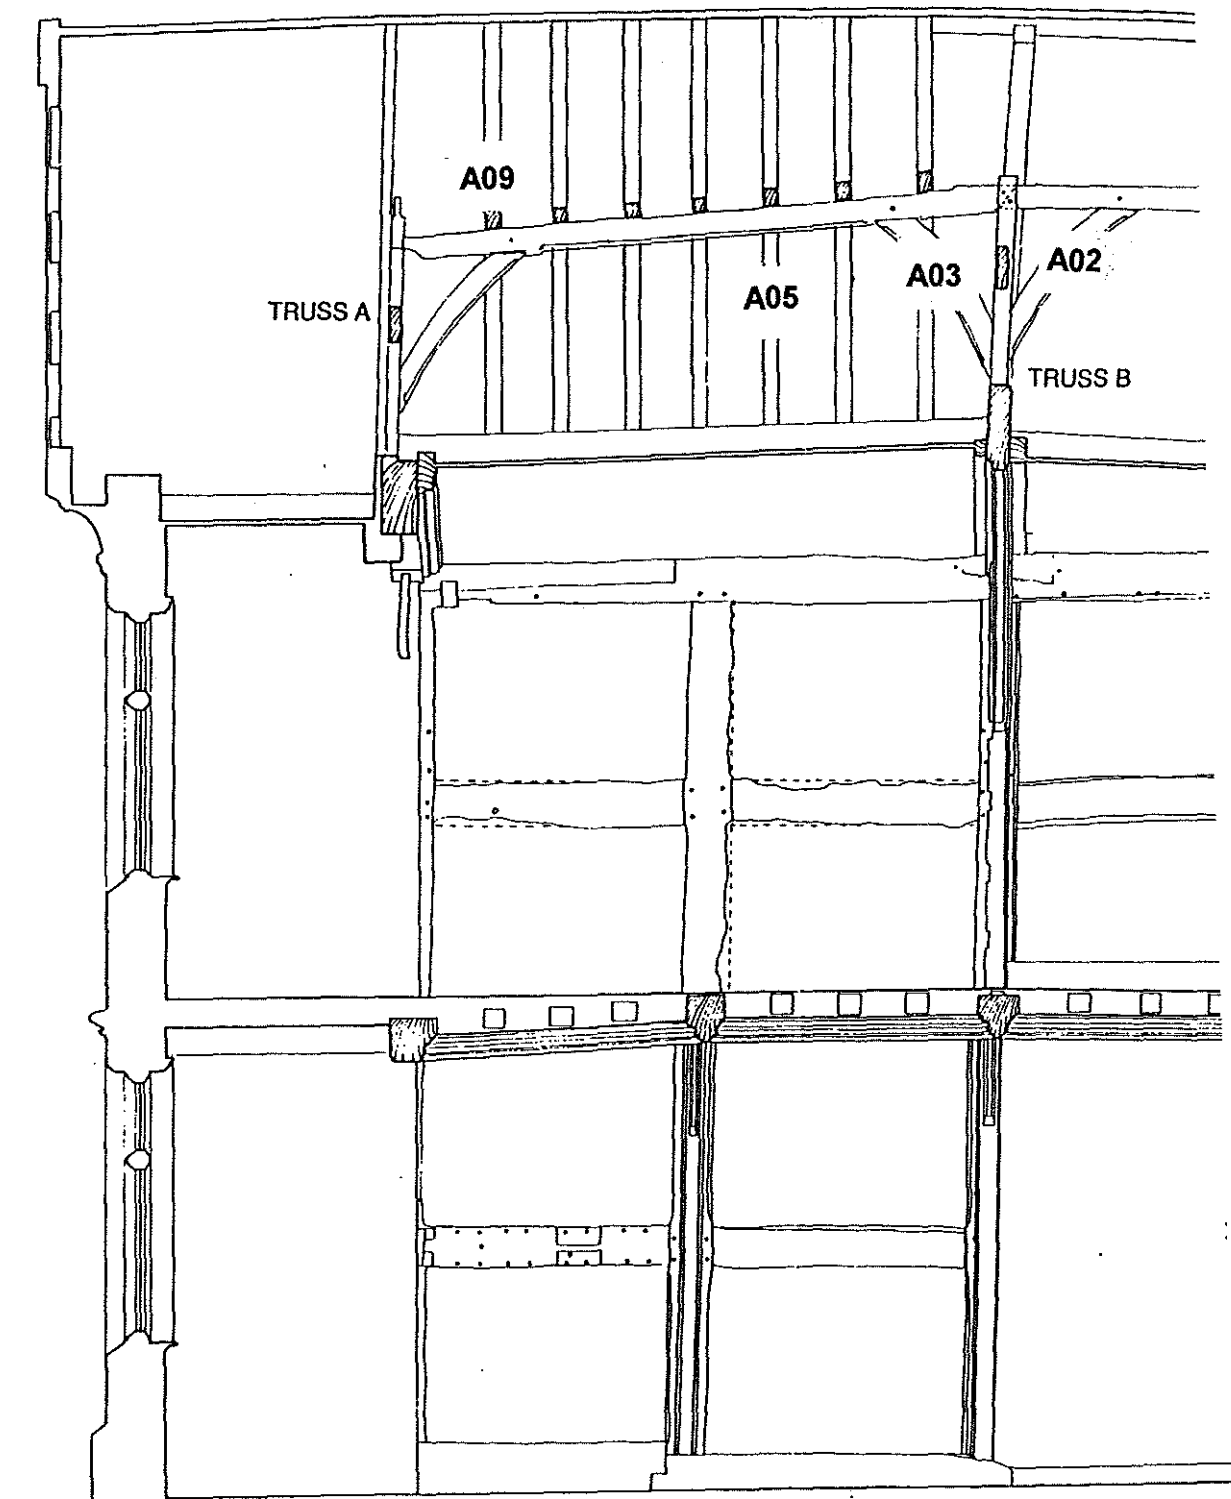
Drawing to show approximate position of sampled timbers from the Great Hall, the west wing, and the "link block" (based on first-floor plan)
